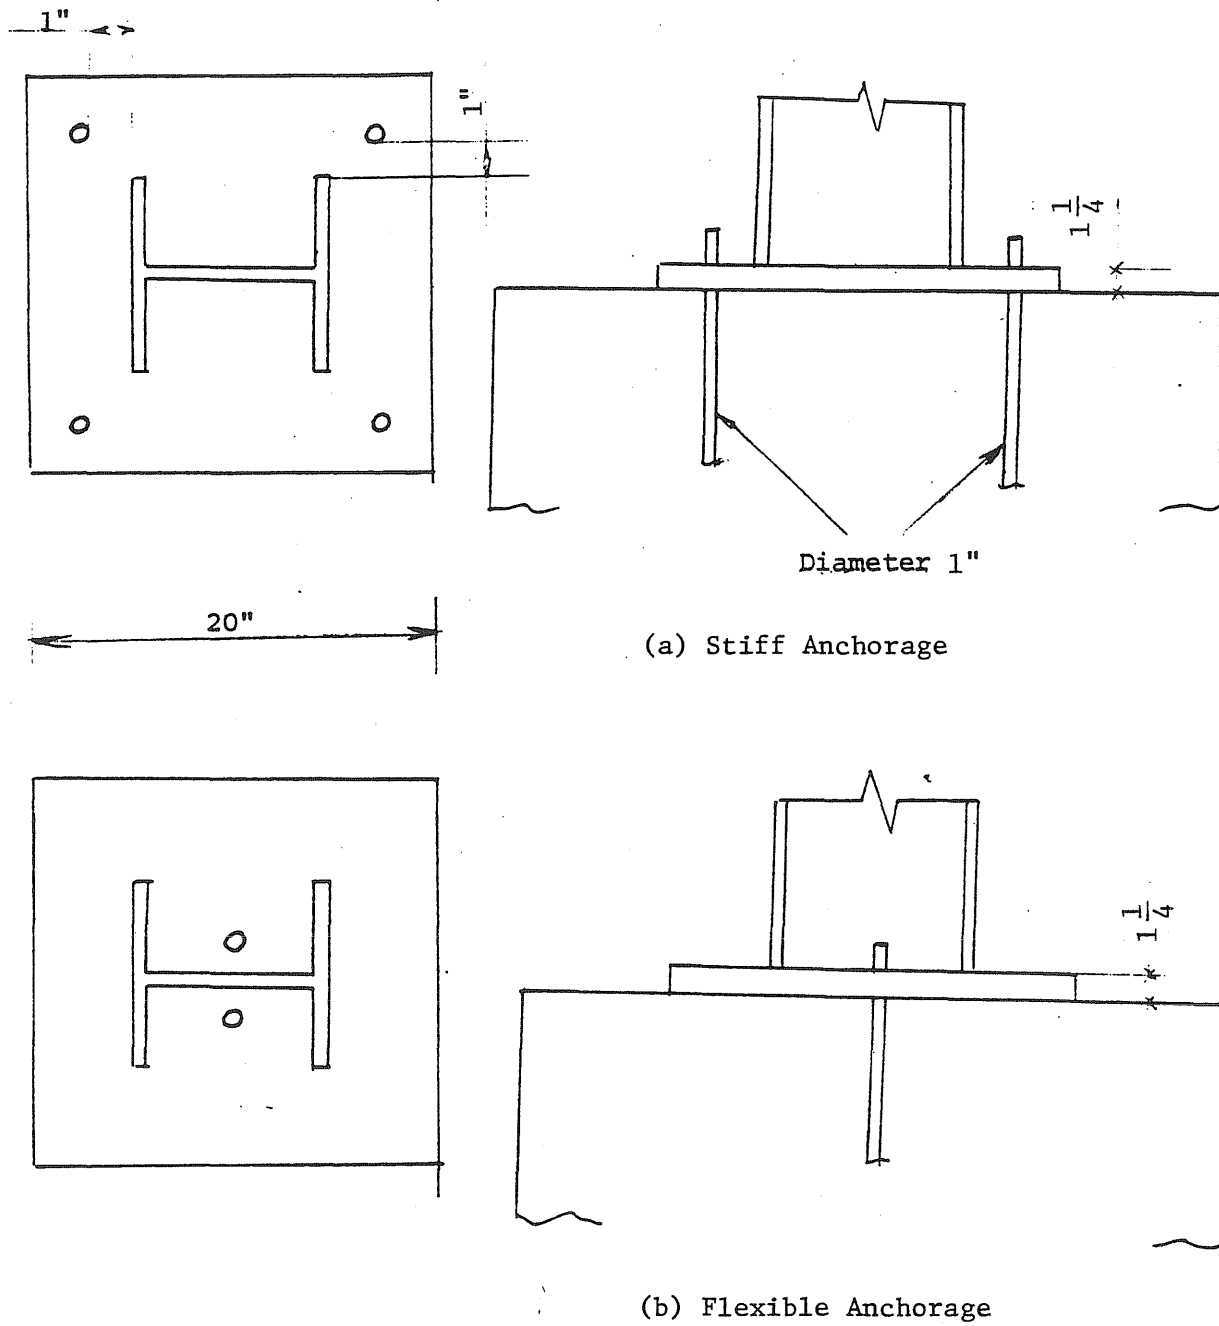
Dimensions of Column Anchorages of Ten-Story Building Frame
